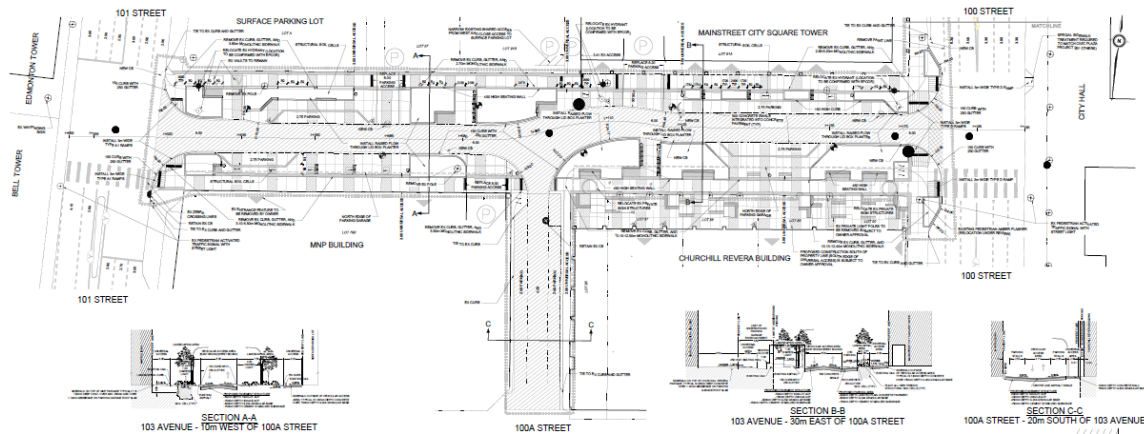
Preliminary Engineering (Checkpoint 3) for 103 Avenue Streetscape (100 to 101 Street)
